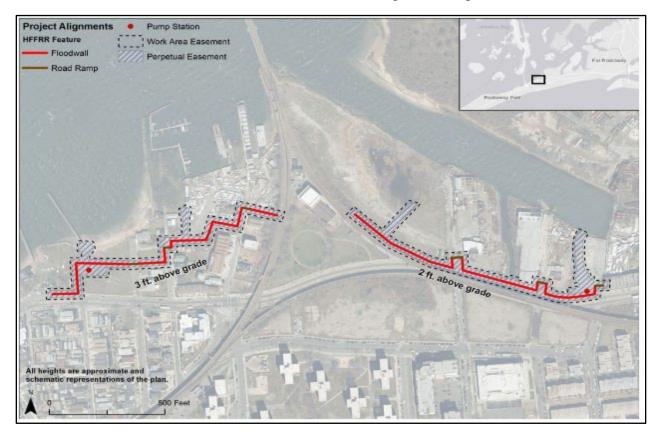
Aerial photo with plan layout of Hammels HFFRRF. Illustration credit: USACE (2018a).
